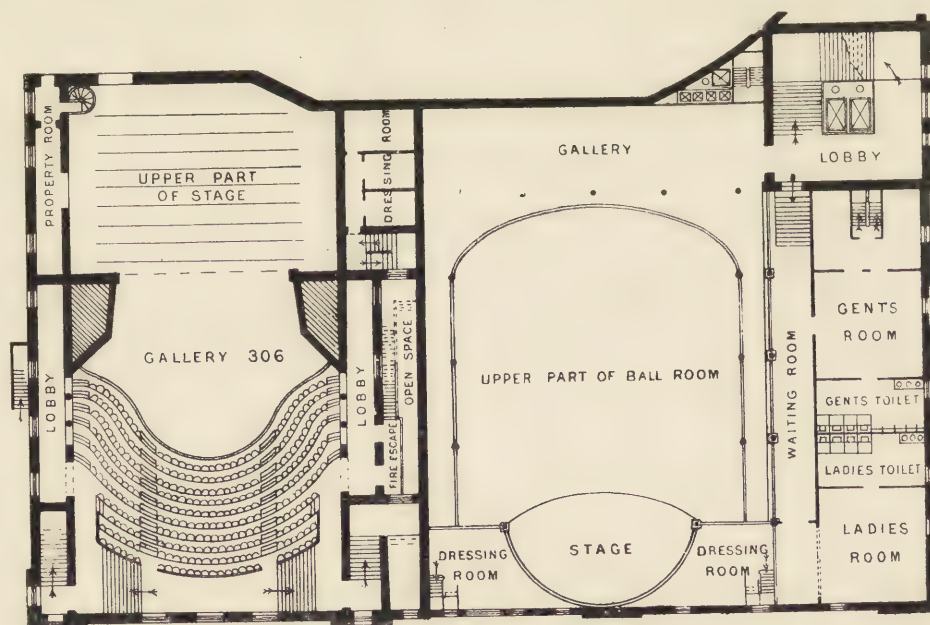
MADISON SQUARE GARDEN BLOCK: PART PLAN OF SECOND FLOOR.
